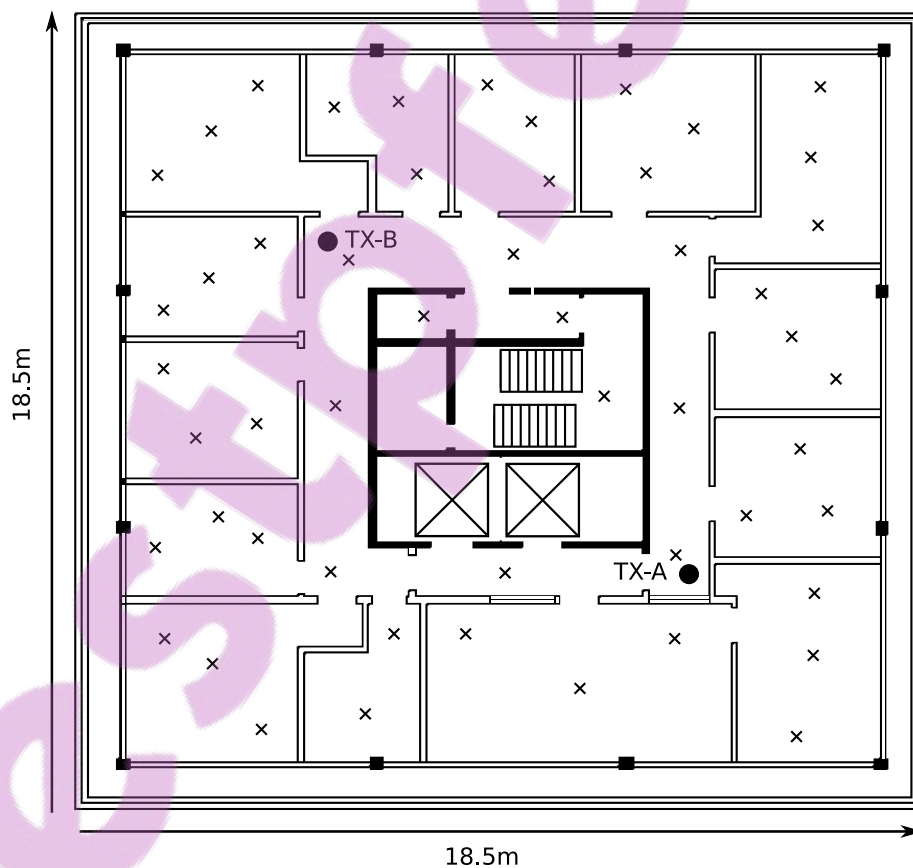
Floor plan of the Engineering School Tower 8th floor. Potential BTS locations are TX-A and TX-B and potential MT locations are marked 'x'.
